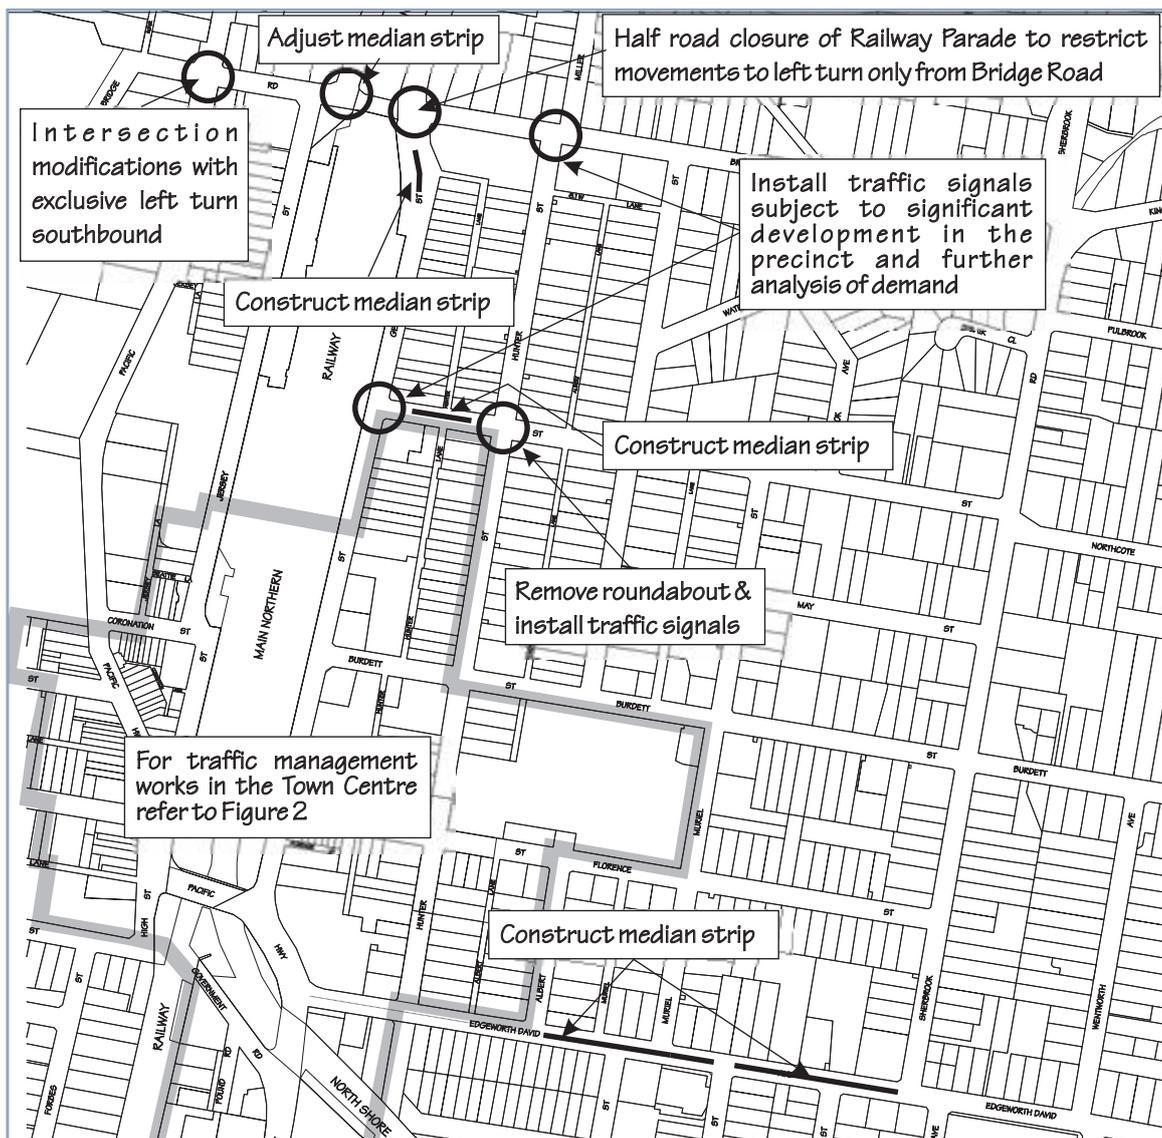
(ab): Traffic Management Improvement Plan - Figure 1. (C)
